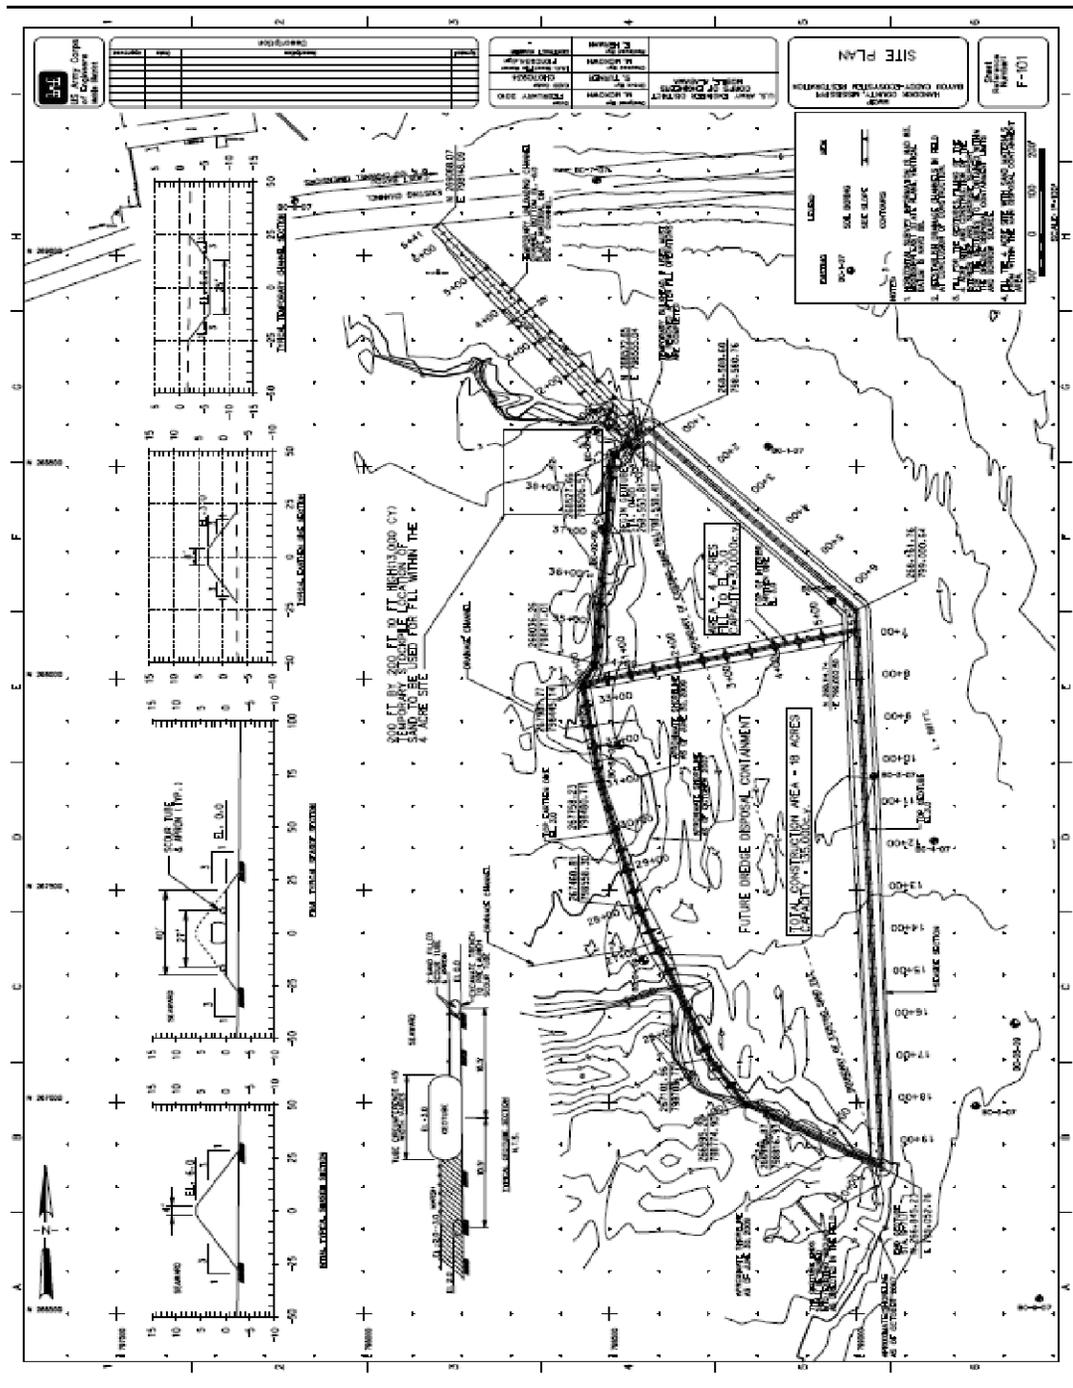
Site Plan for Bayou Caddy Restoration Project Constructed in 2010
